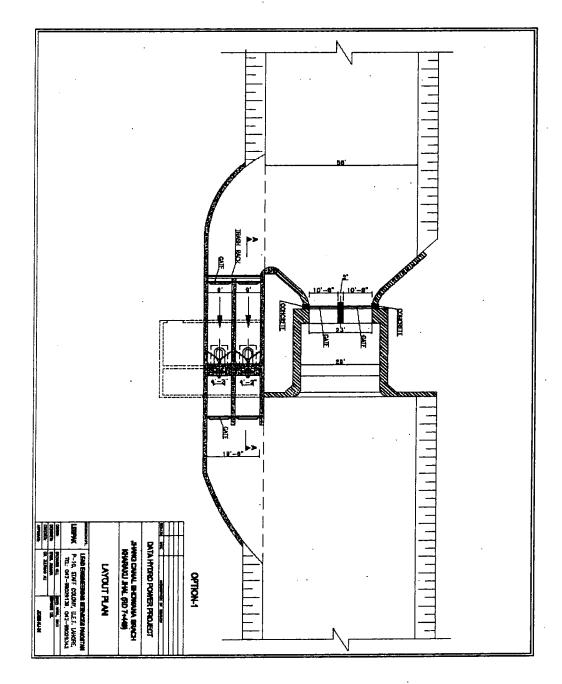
Fall at RD 7+449 (Option-1, Layout Plan)
